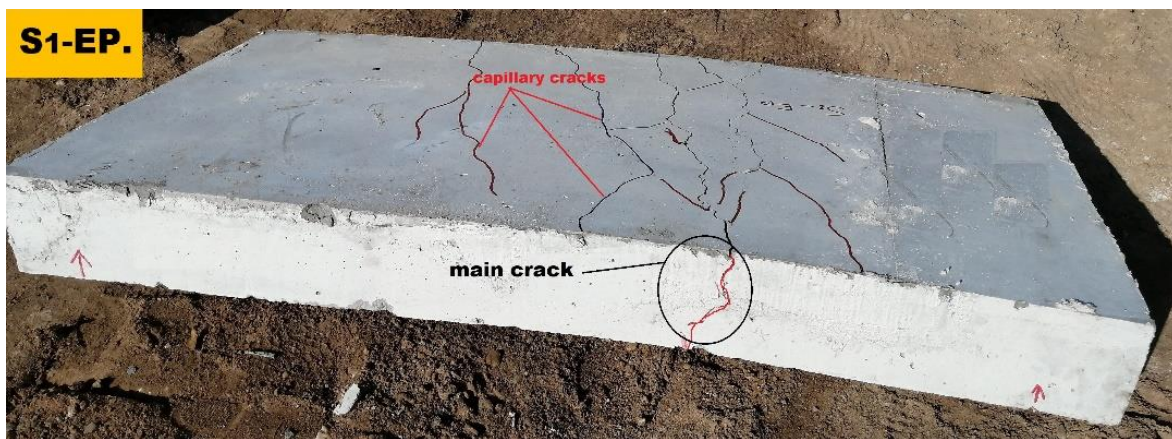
Mode of Failure and Crack Patterns for Specimen S1-EP.
